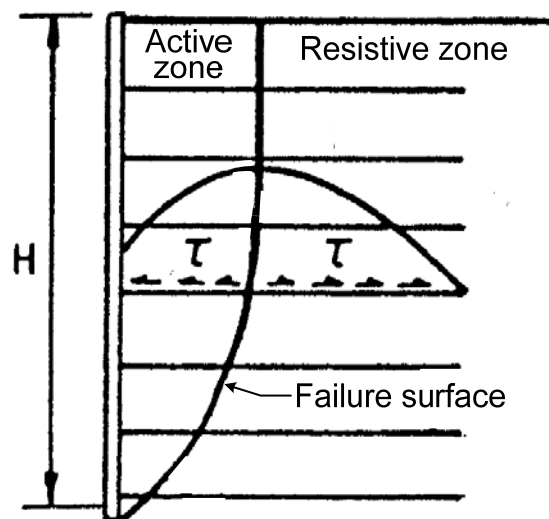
Development of shear forces between the backfill and reinforcement within an MSE wall (adapted from Schlosser 1990)
